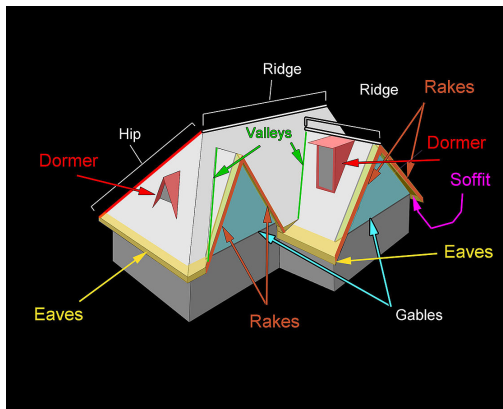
<https://en.wikipedia.org/wiki/Roof#/>
